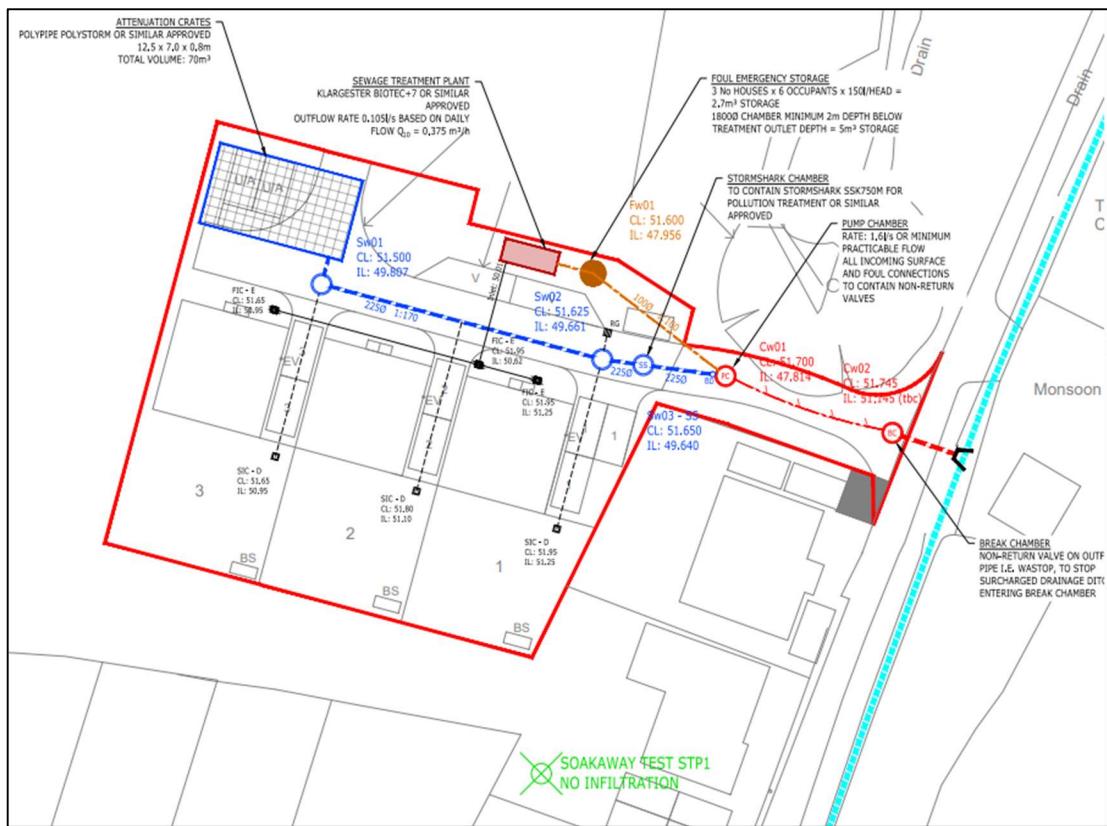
Drainage routed outside of the Root Protection Area of T001 (Oak)
